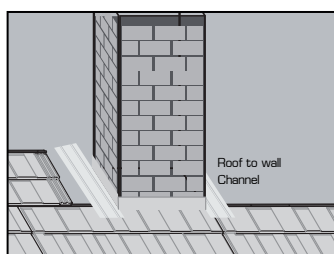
(1) Install roof-to-wall channel on both sides and at the back of the chimney; bend the front panel upwards as you would at a ridge. (2) Seal all around the chimney with roofing grade sealant. (3) Install Z bar around chimney.
